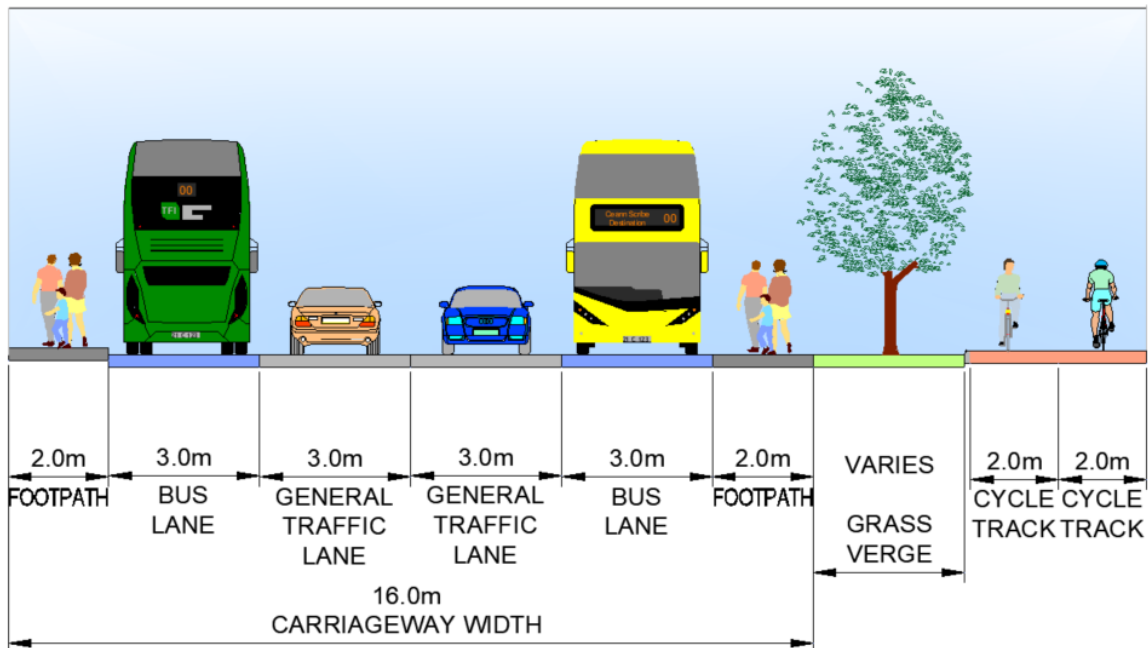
Section 2 Option 4 Indicative Cross Section
